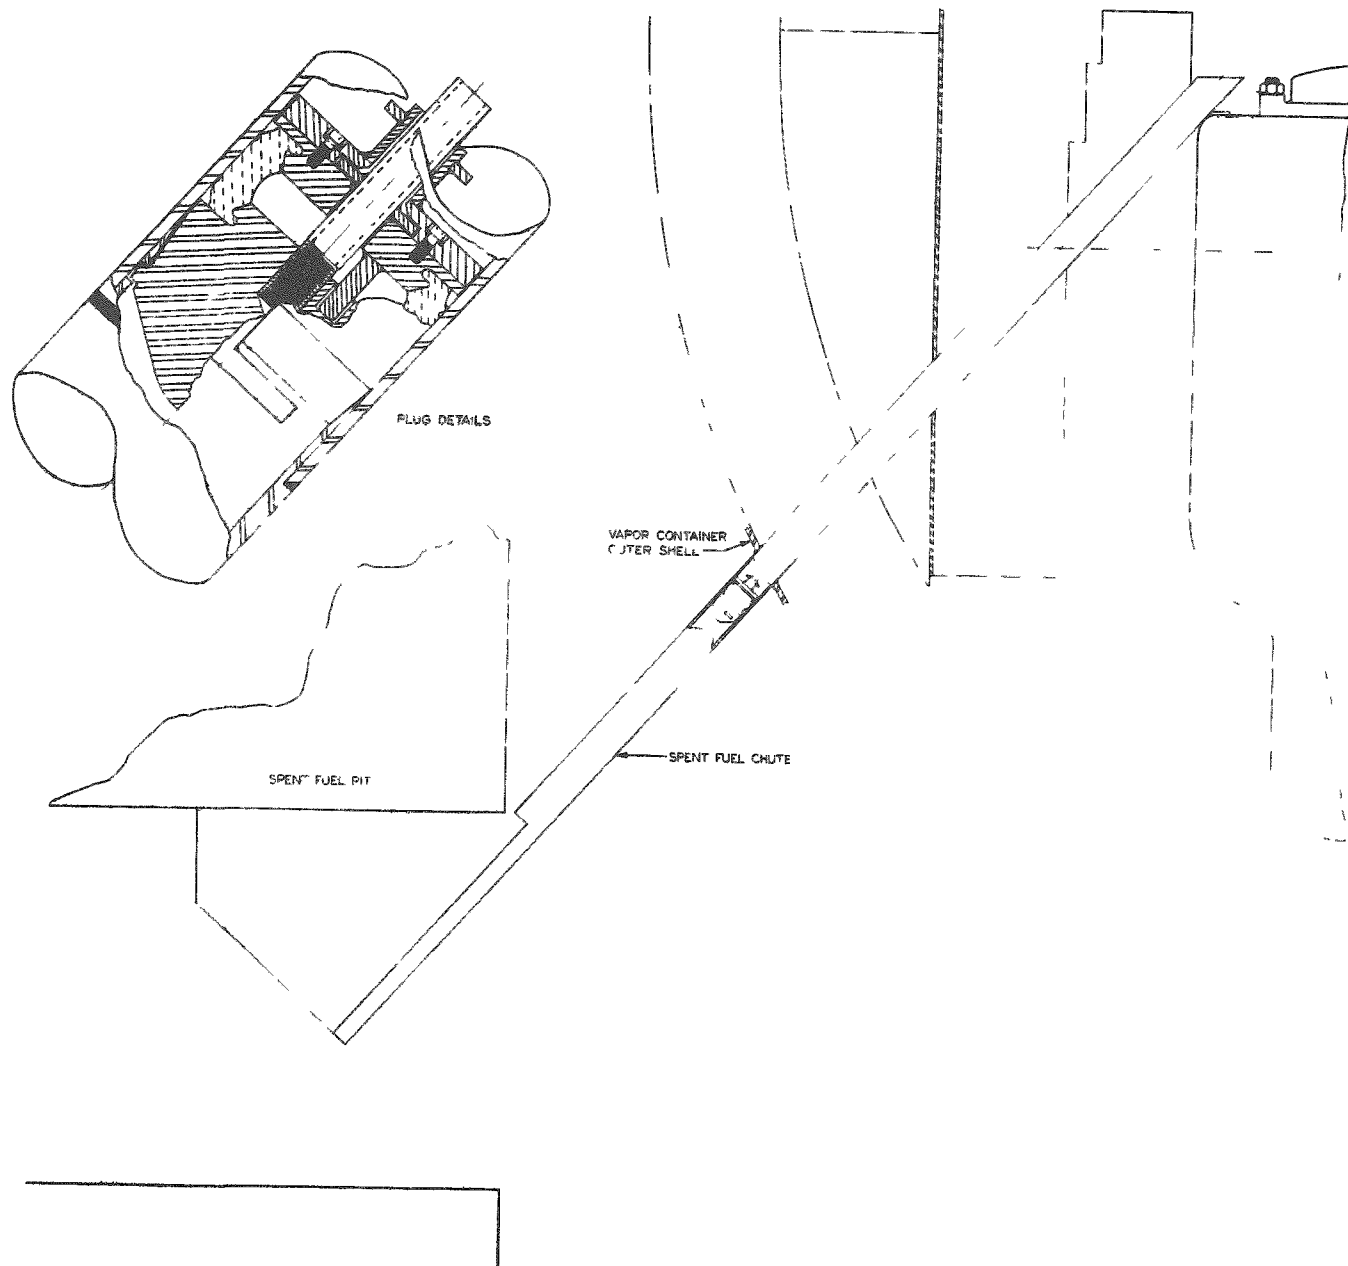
FUEL DISCHARGE TUBE AND PLUG VALVE
